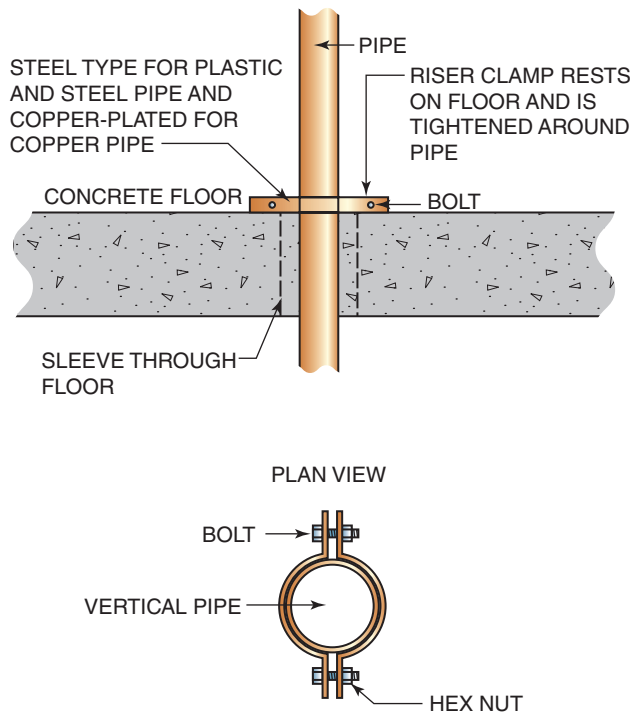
A riser clamp is installed to support a vertical pipe penetration through a floor but may not be required by local codes in residential construction.
